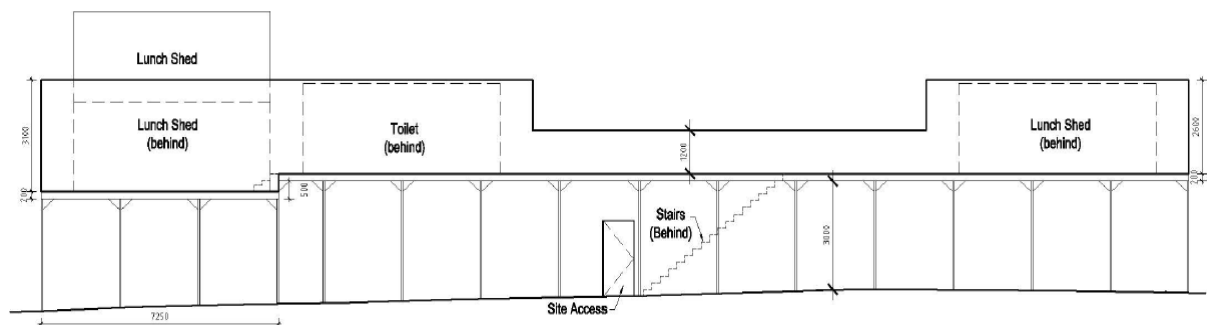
Diagram of typical Elevation Plan for Type B Hoarding with Site Shed. Representation of typical layout, indicative only
